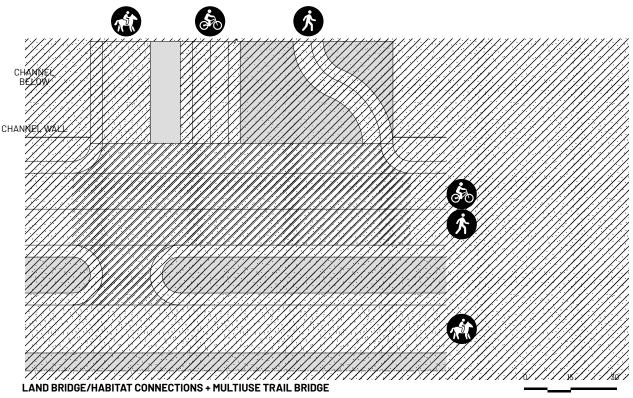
Land bridges create habitat and movement opportunities through varied planting and topography. Pedestrian, bicycle, and equestrian paths should be a minimum of 12' wide between railings. When possible, slope bridge paths to a maximum of 5%. If sloped up to 8.33% or more, provide landings and railings as per ADA requirements for accessible ramps. Cross-slope should be a maximum of 2%. Use clear centerline striping and environmental graphics, developed with a project's specific needs, to warn trail users of a bridge crossing and provide a clear connection to equestrian trail.
